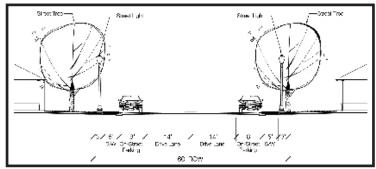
Collector Street w/Parking on 2 Sides - Woodbridge by Del Webb, Section T
